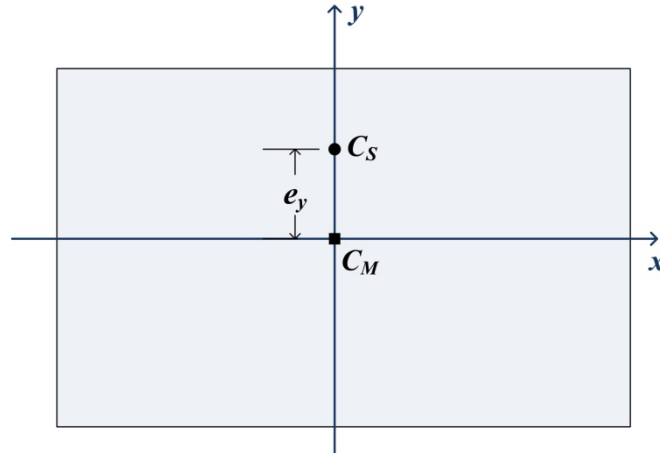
Plan of the single story building with eccentricity only in y-direction.
